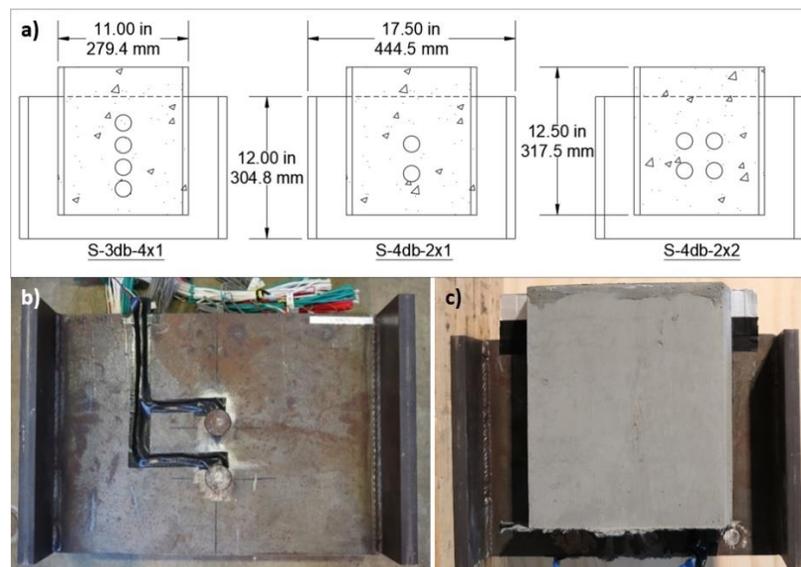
a) CAD model of the three specimen configurations investigated, b) fabricated specimen with strain gauges prior to casting, and c) completed specimen with UHPC panel.
